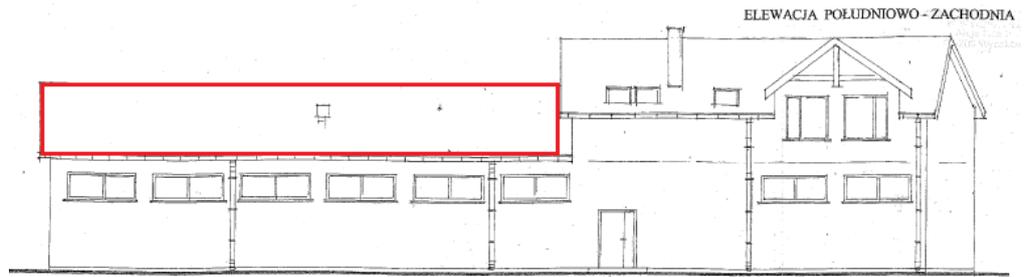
The south oriented facade and roof of the factory building. DEKOR-MEBLE
